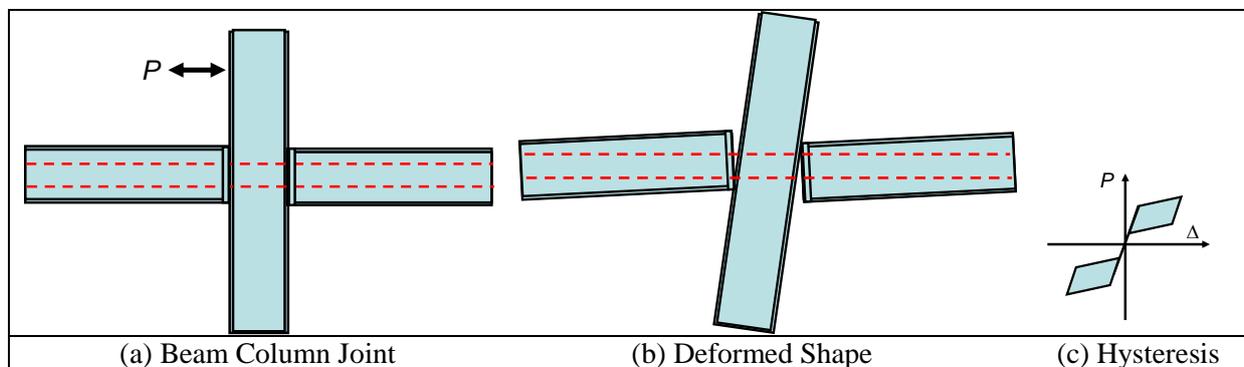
Post-Tensioned Beam Deformation and Hysteretic Behaviour (MacRae, 2010)
